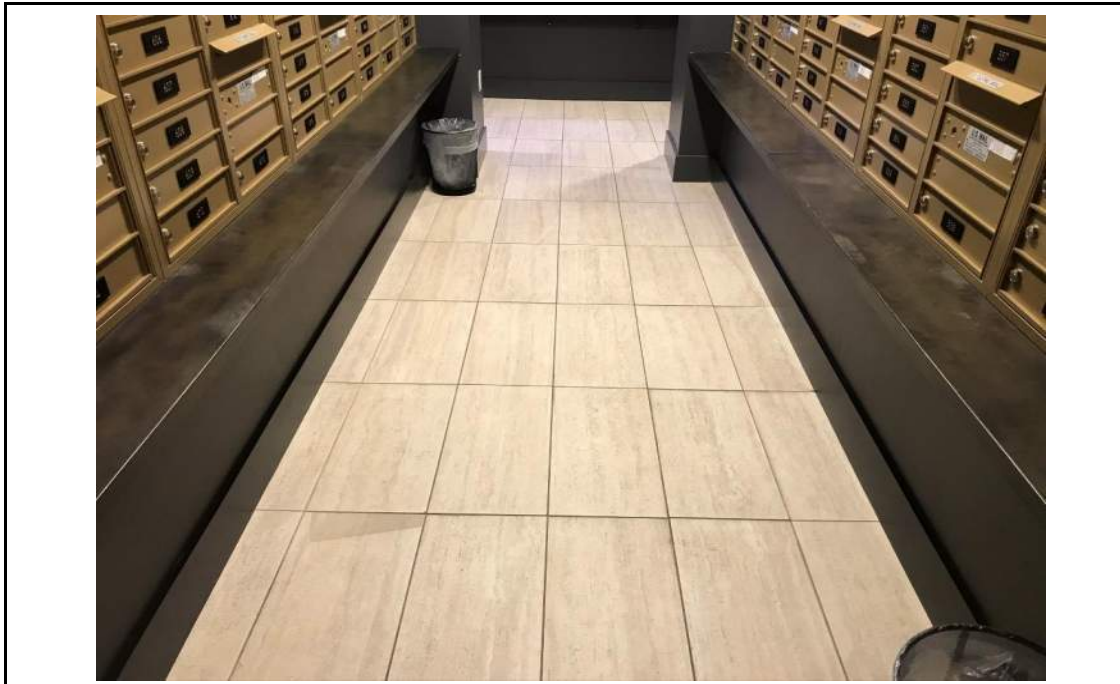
First floor concrete slab covered in tiles within the mail room, facing south. 6 February 2020.
